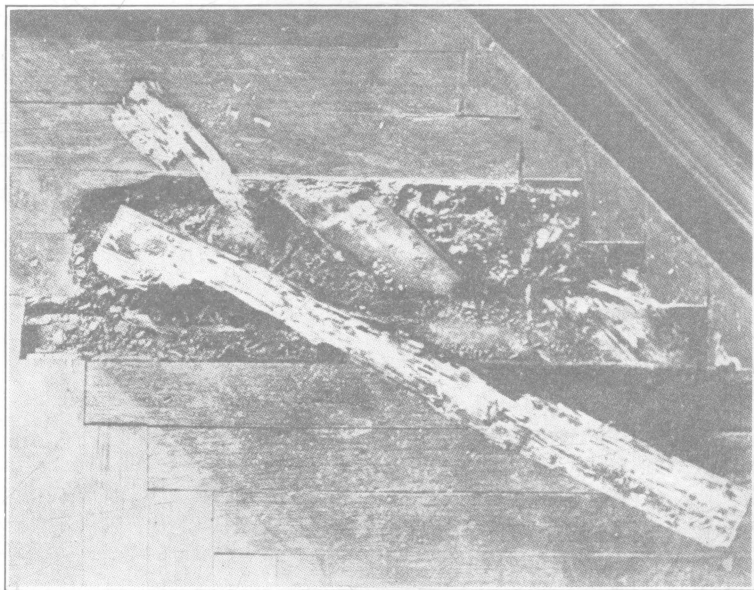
Quartered oak flooring damaged by termites (after Snyder)
